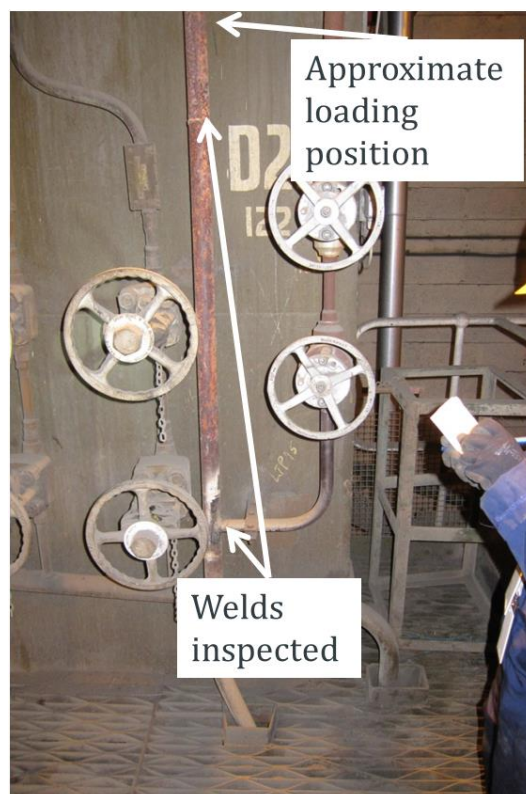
Photograph showing the location of the welds and shaker at site 3.
